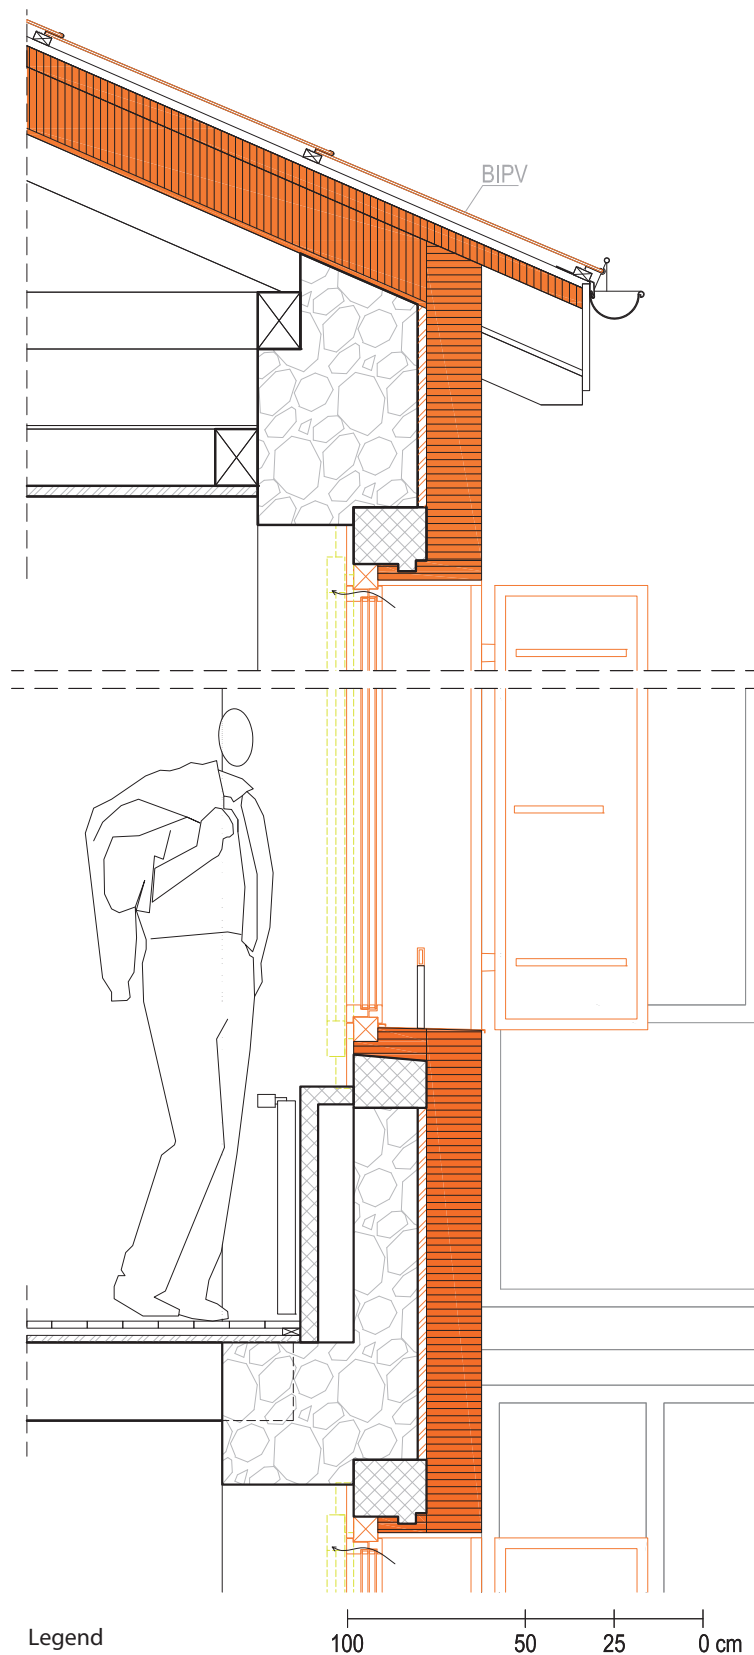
Façade constructive detail, S1-Conservation, Archetype 1.
